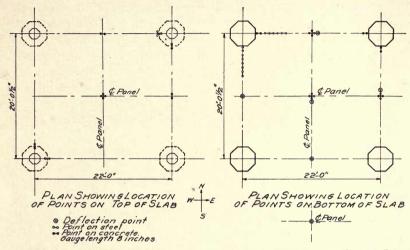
CARLETON BUILDING TEST; PLAN SHOWING POSITION OF GAUGE LINES.
